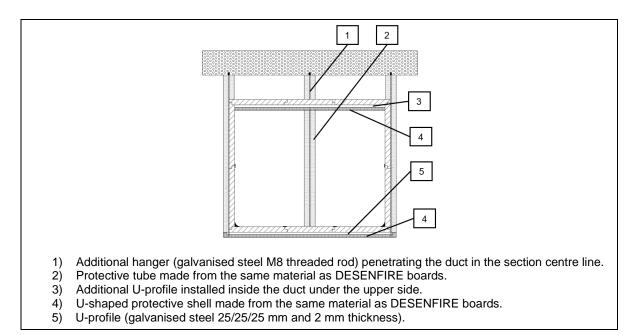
Reinforcement of big section ducts with 3 hangers (duct cross-section).
